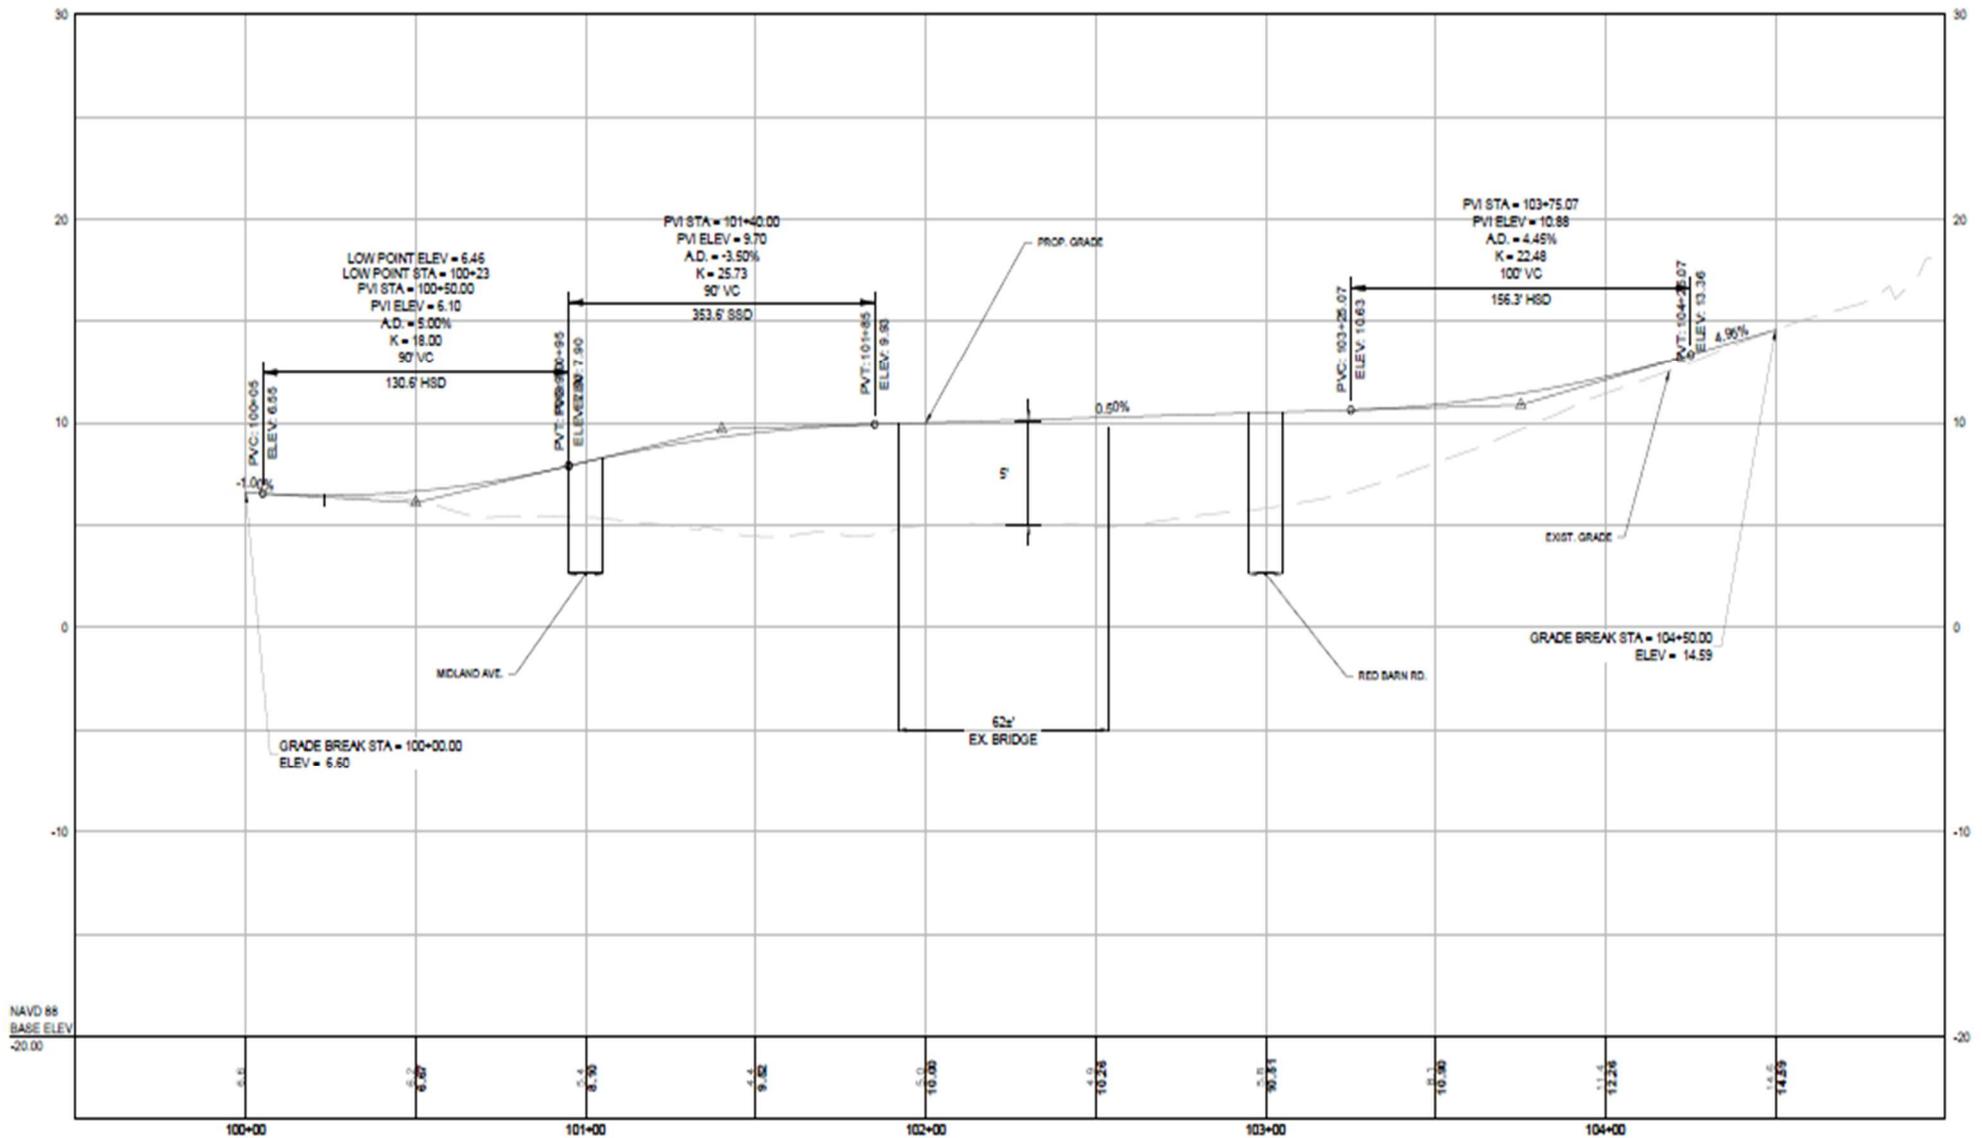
5-foot Raised Profile of Massasoit Bridge
